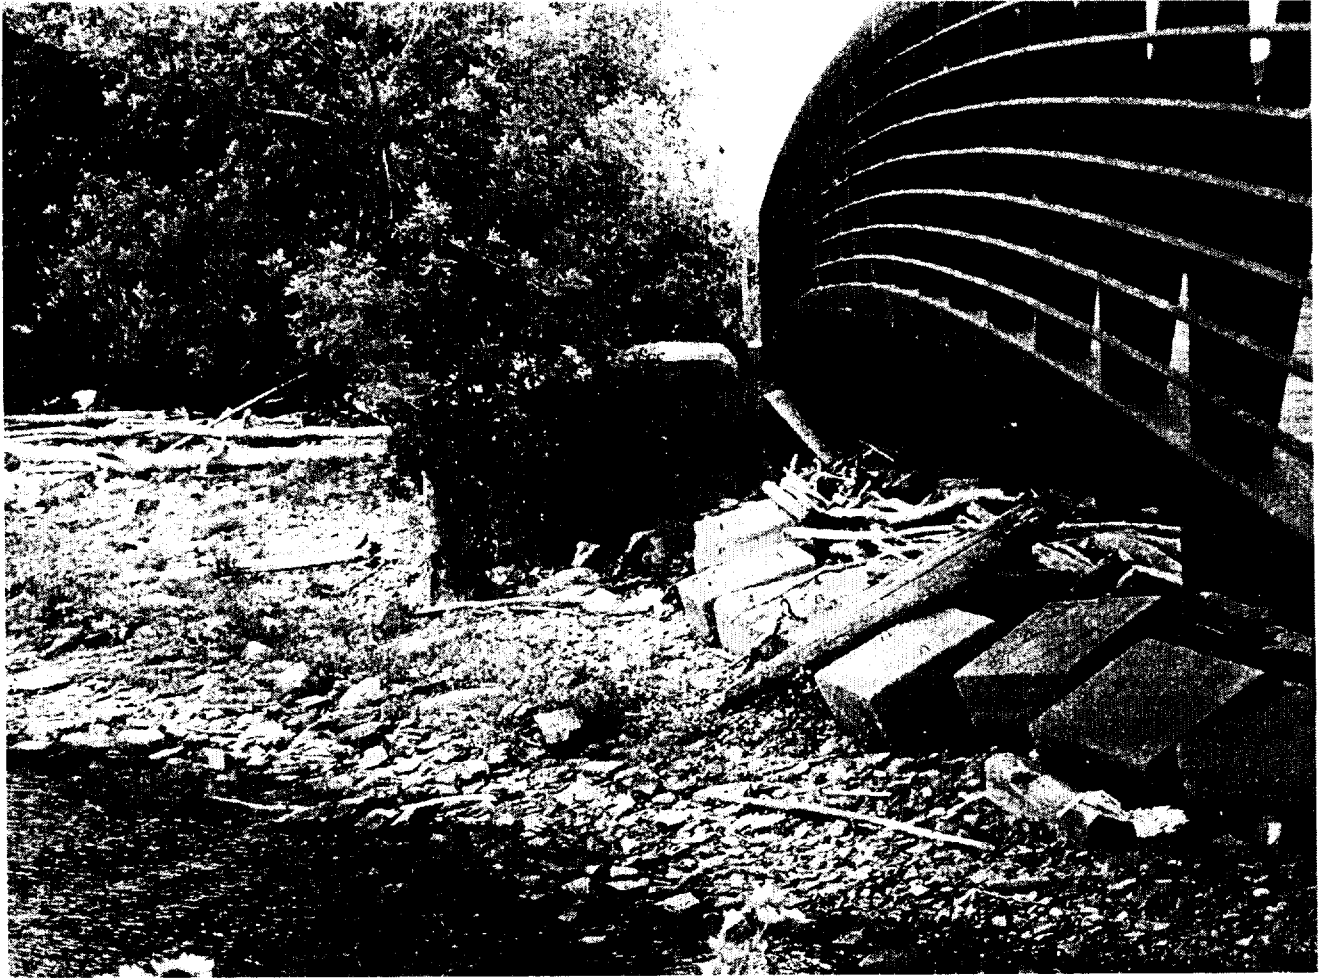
View of shore at barge canal outlet with concrete counterweight at center. Note cut made in upper right portion of counterweight to accommodate the bicycle path bridge. View to north.
